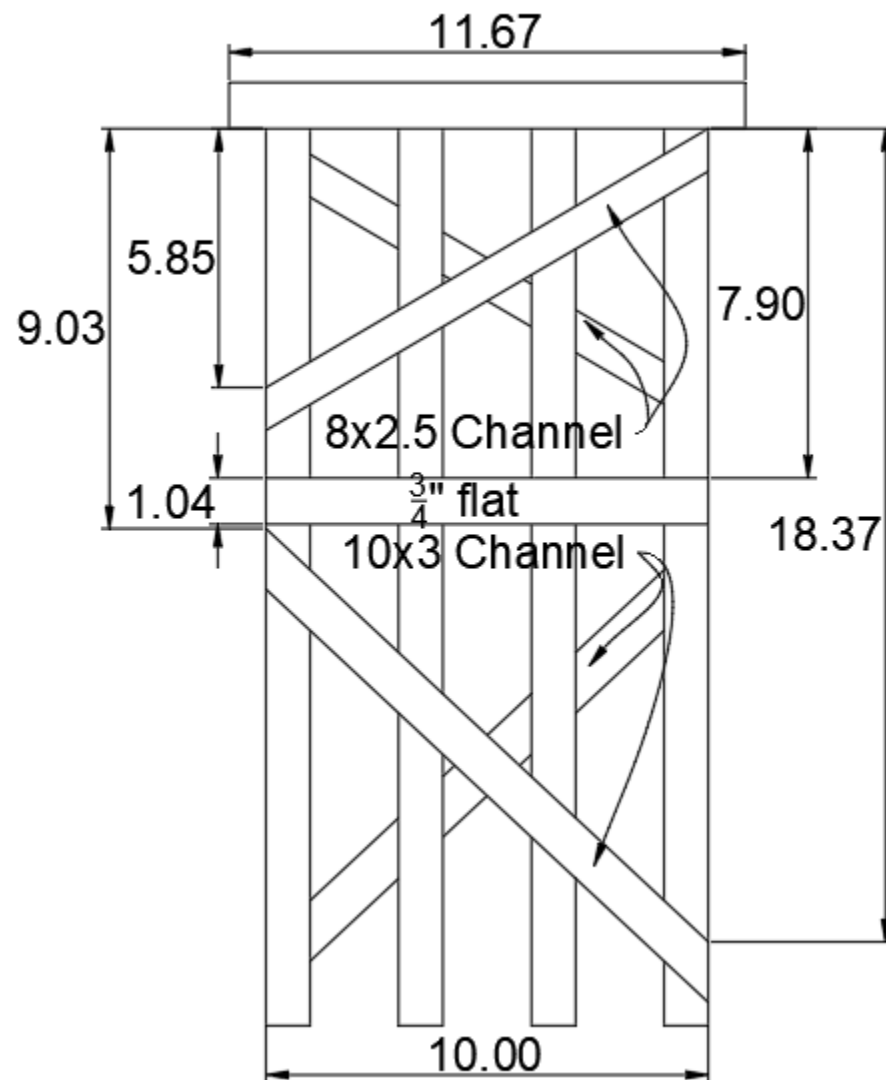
Detail of the spur bridge Pier 3 (pier closest to the centerline of the channel) on the left bank.
